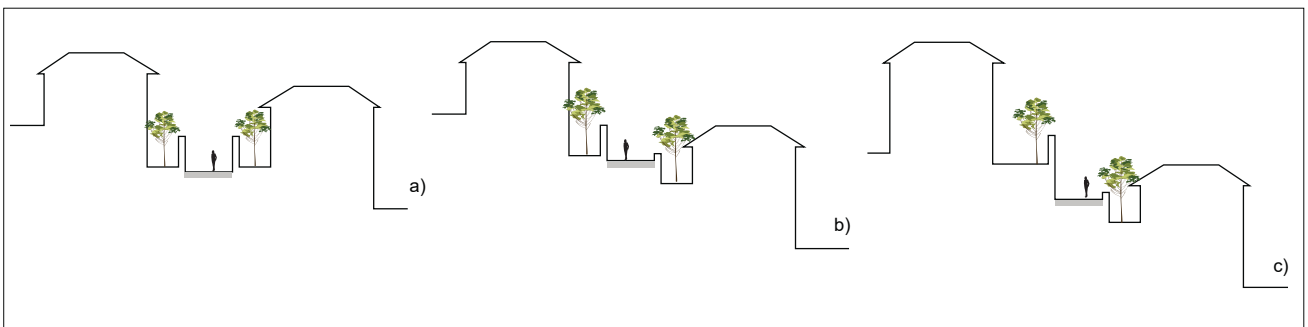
, Analyses of typical sections of road "positive space" in Gjirokastra (source: author's)
